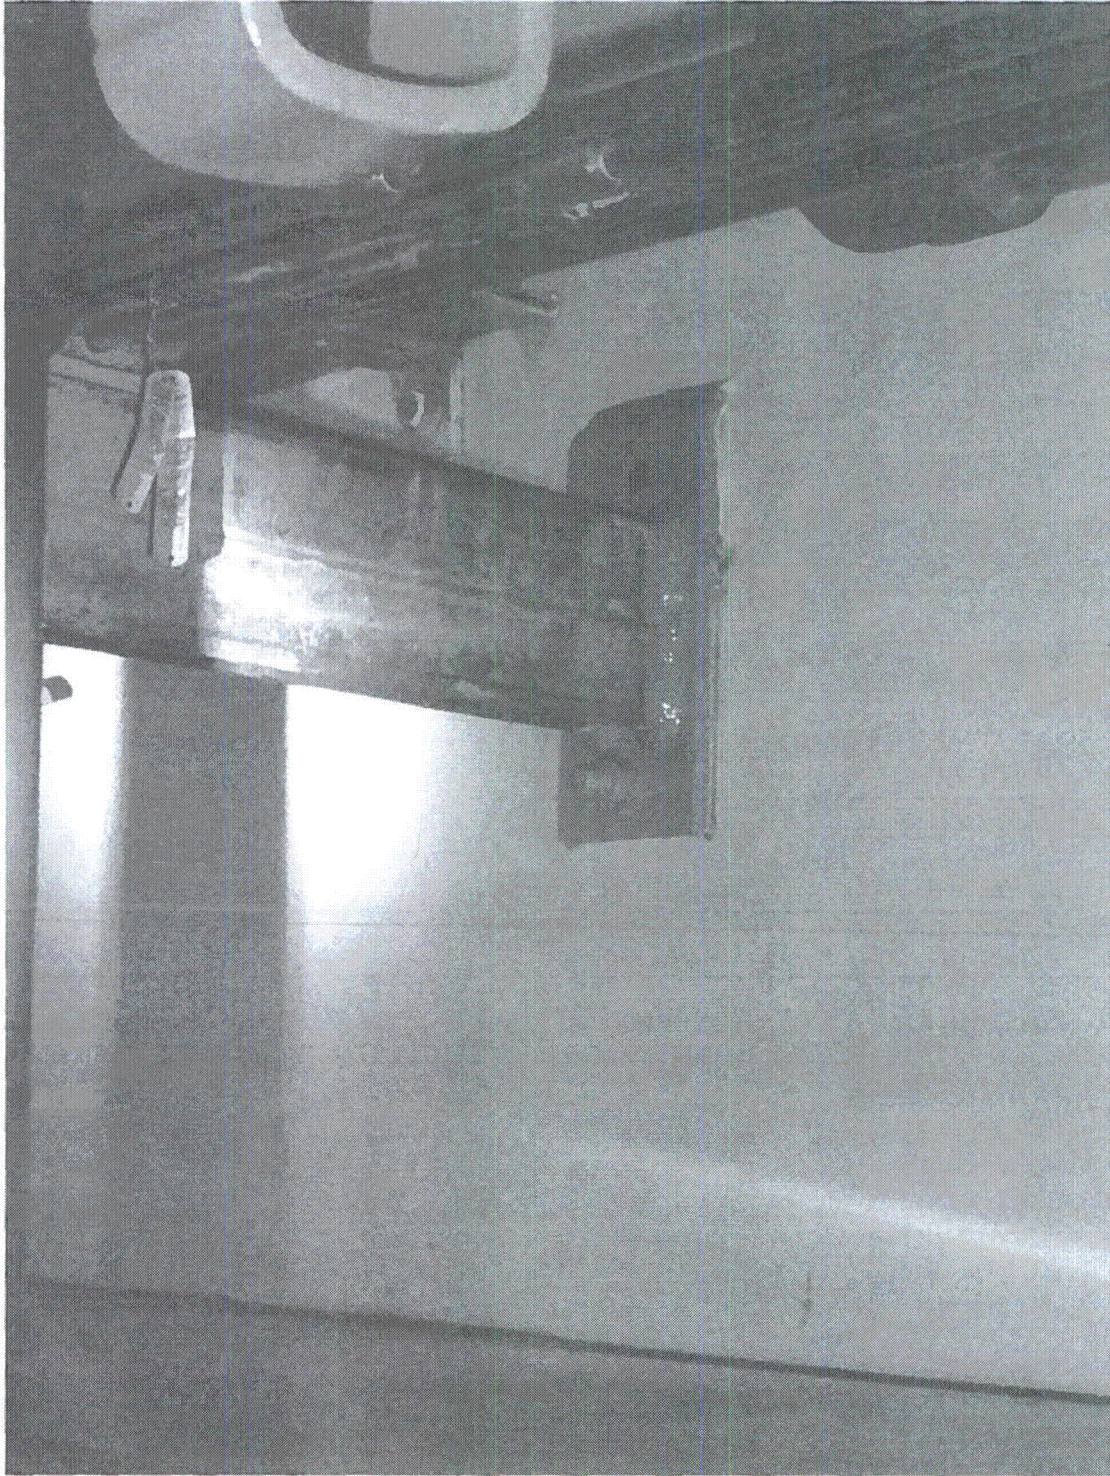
Tubing Support Missing Bolt (NE Diagonal Unit 2)
